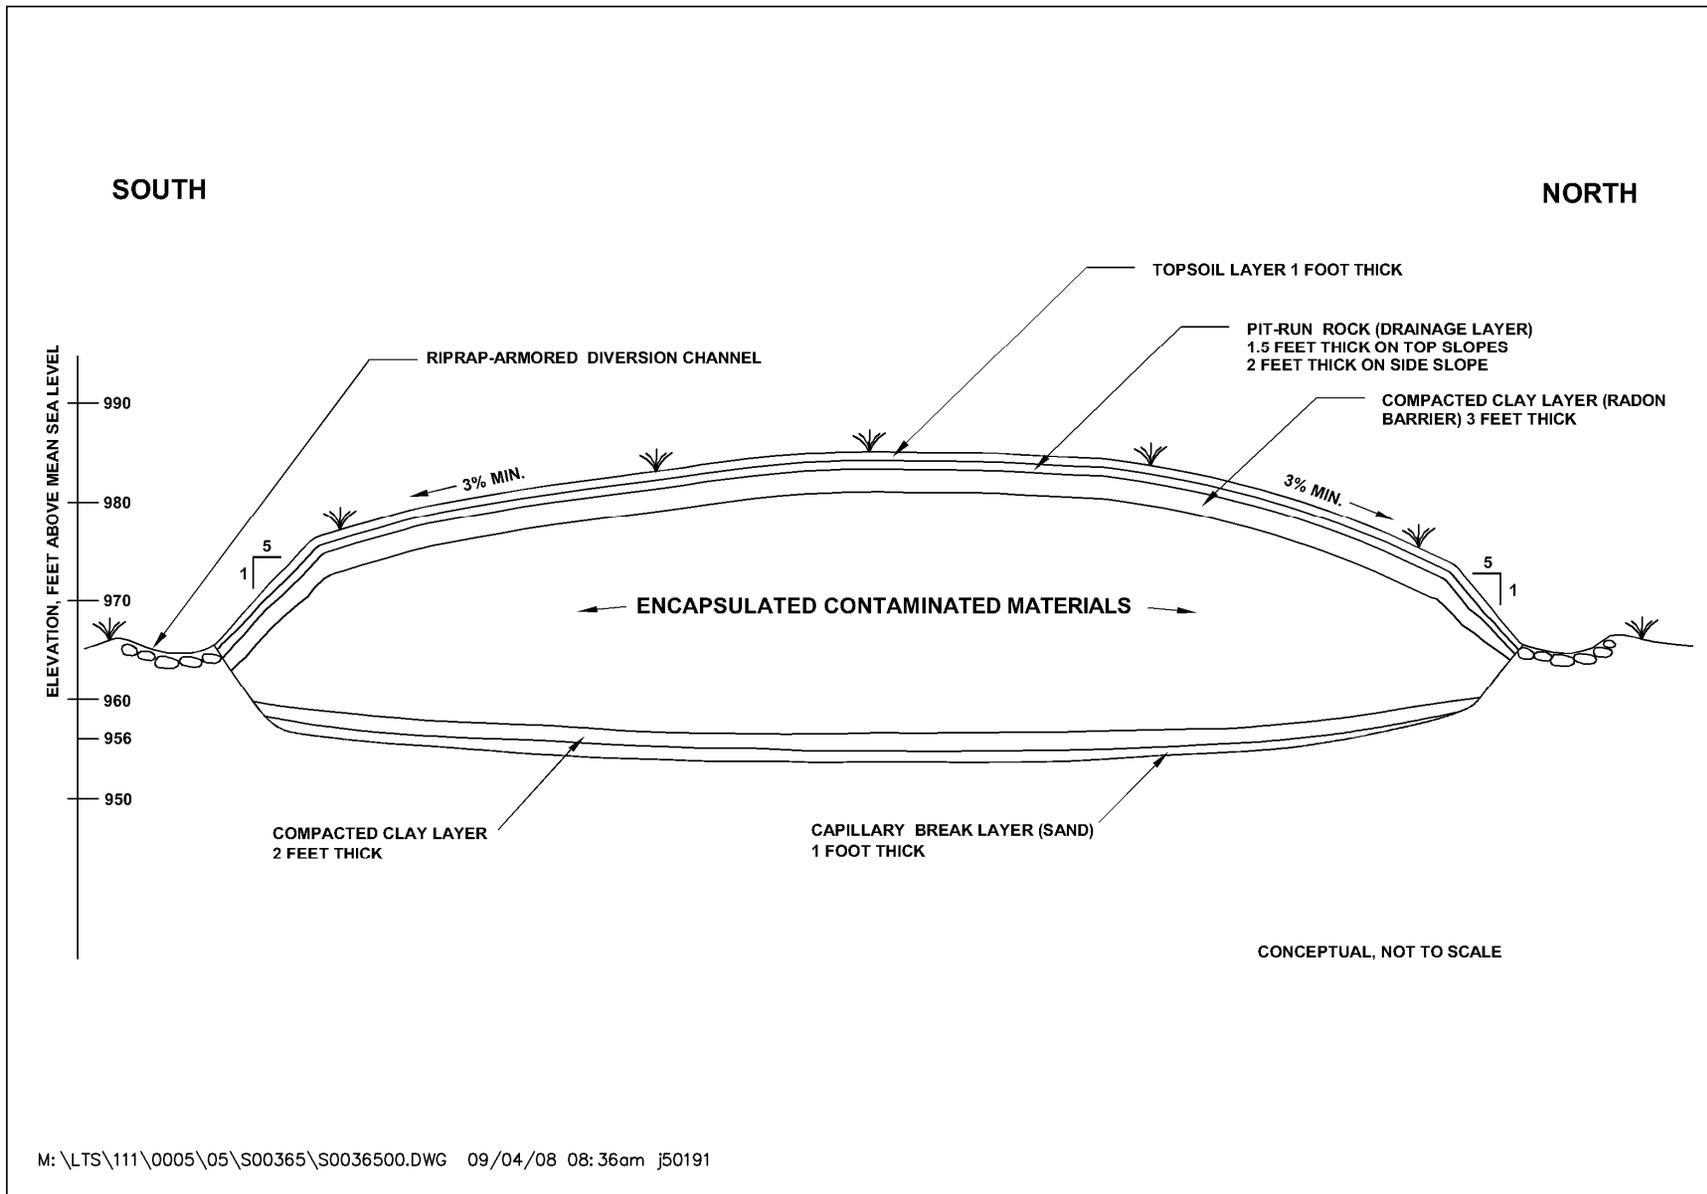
North-South Cross Section of the Canonsburg, Pennsylvania, Disposal Site
